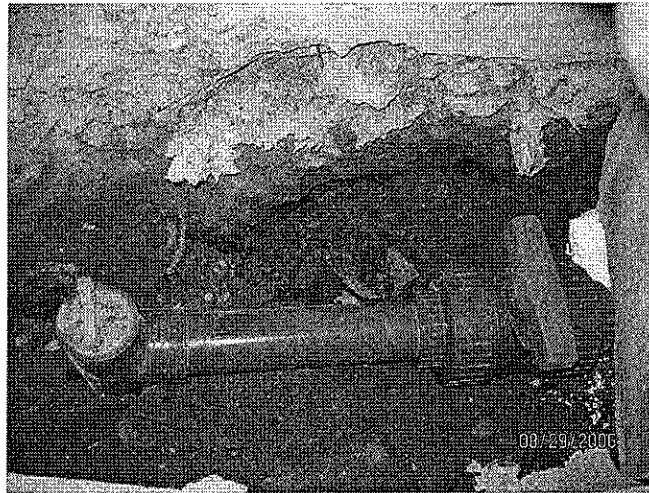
AS-1 riser connected wTEE to Sch80 2" PVC pipe connecting to a ball valve
